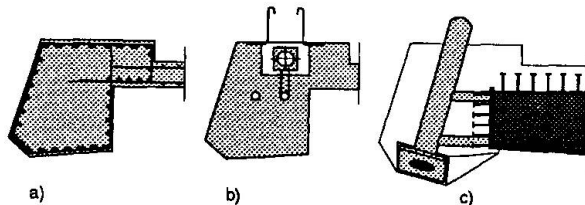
Example of uncoordinated (unbuildable) detailing in general design: (a) Arrangement of mild reinforcement without consideration of splices; (b) Prestressing tendon; (c) Anchorage of stay cable
